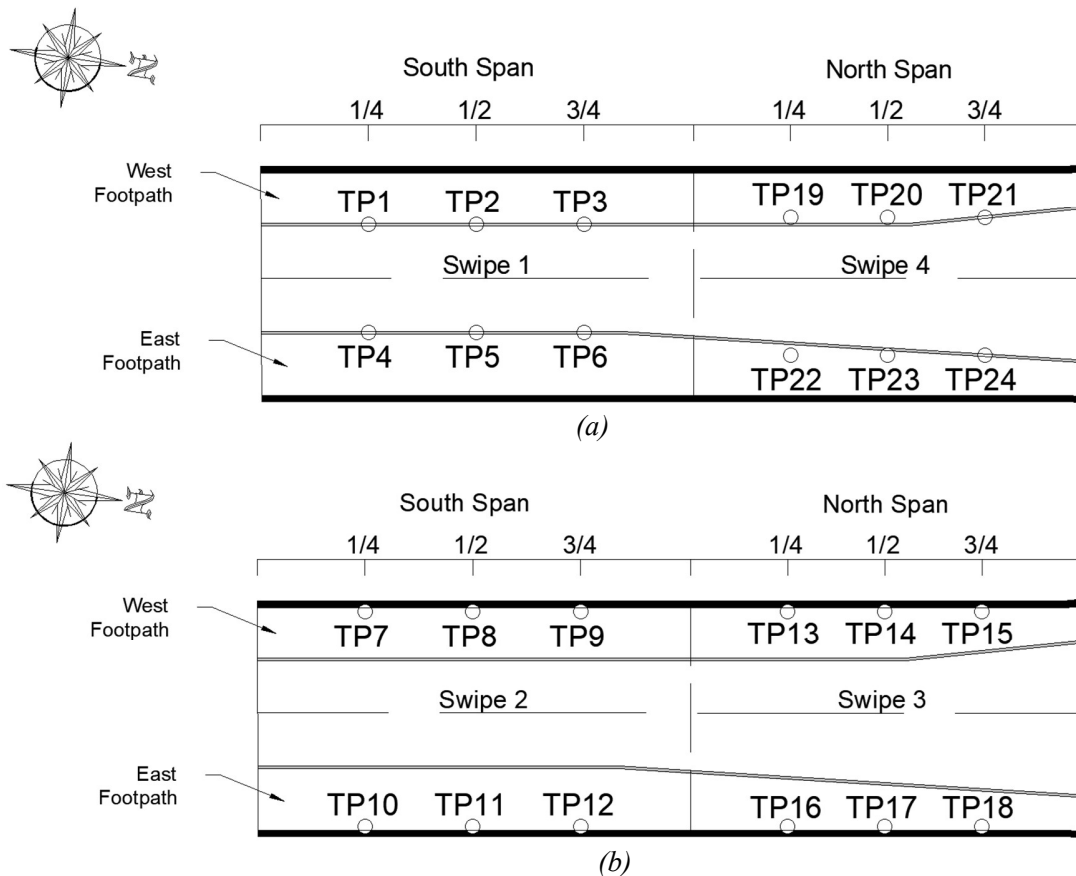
Plan view of bridge showing sensor locations for (a) Swipes 1 and 4, (b) Swipes 2 and 3.
